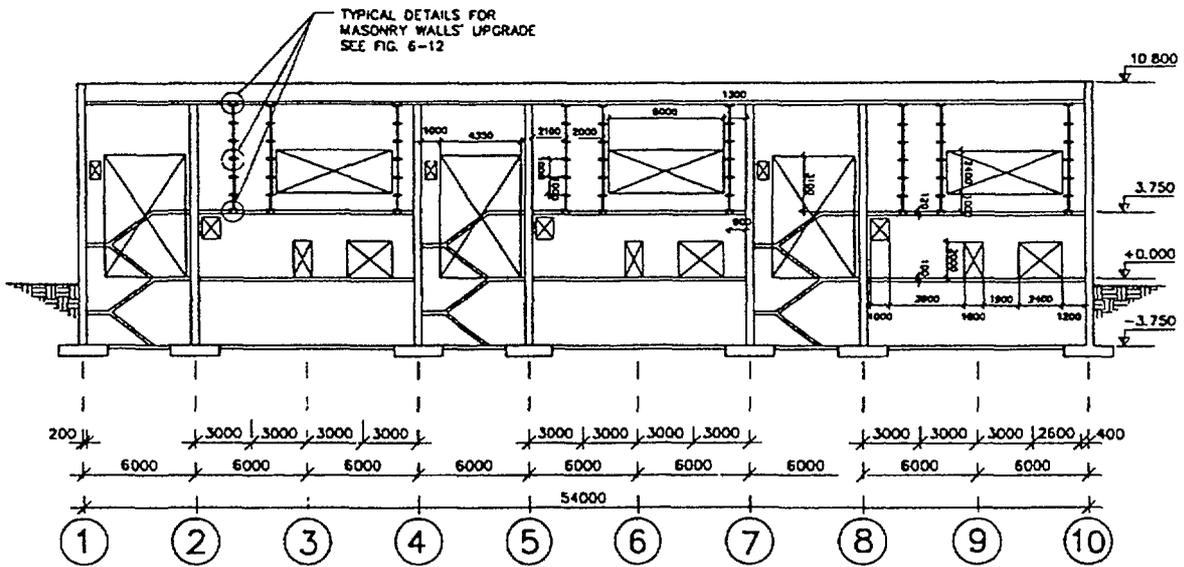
Exterior Wall Elevation At Line "B", Looking South
